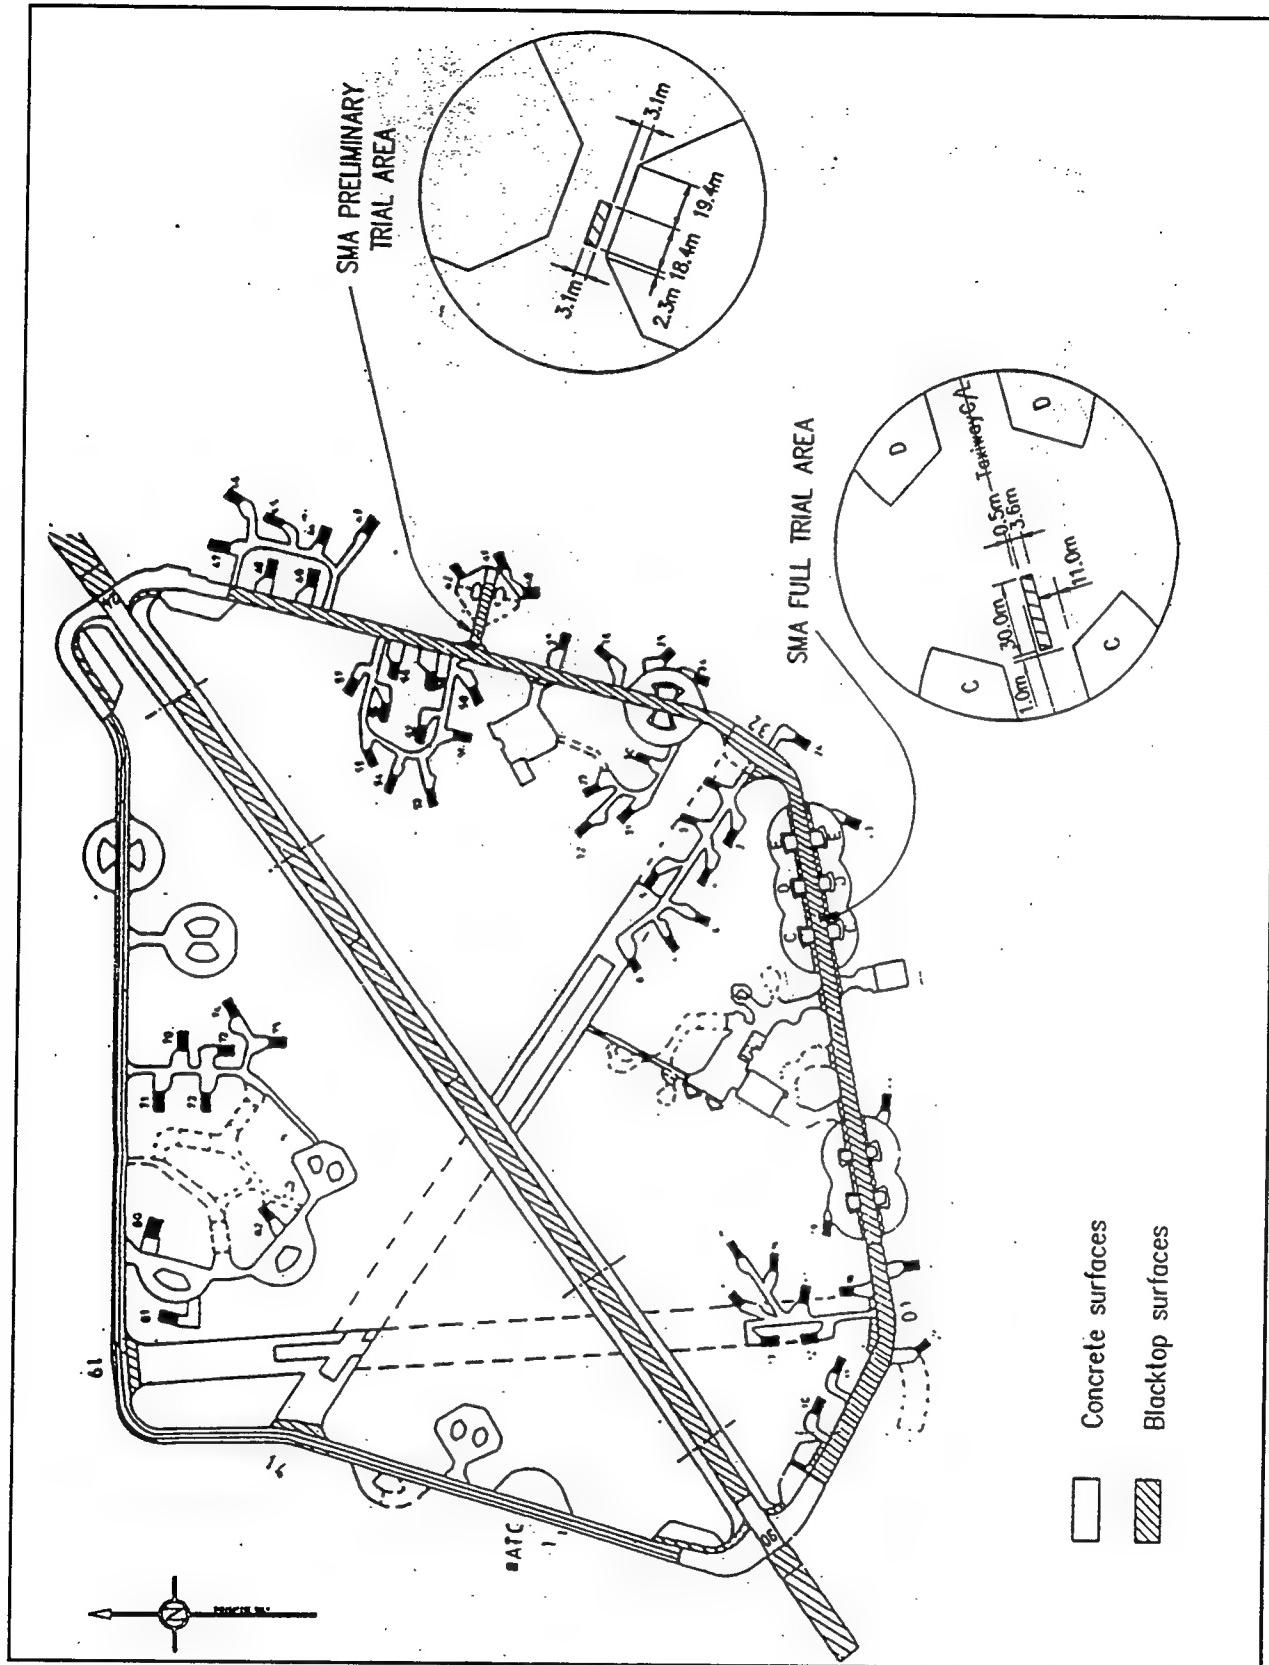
Layout of SMA sections at RAF Lakenheath, United Kingdom
